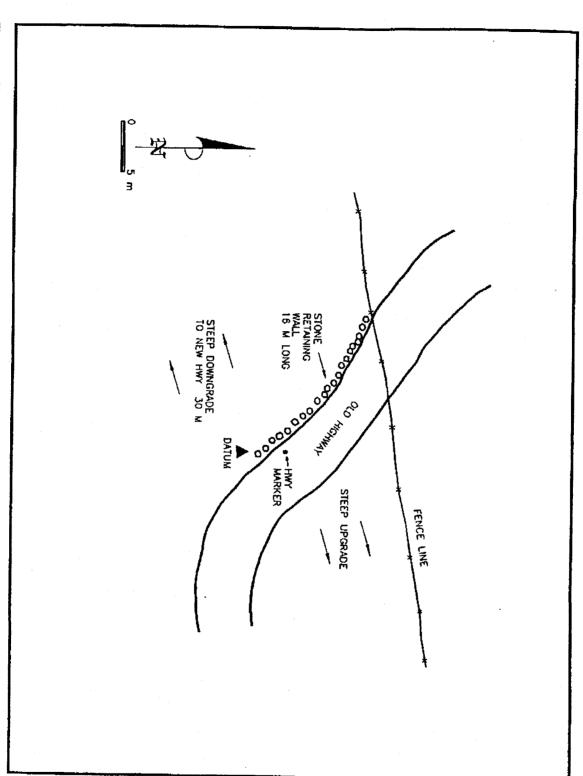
Site AR-03-12-06-2028/AZ U:8:60(ASM) plan map.
